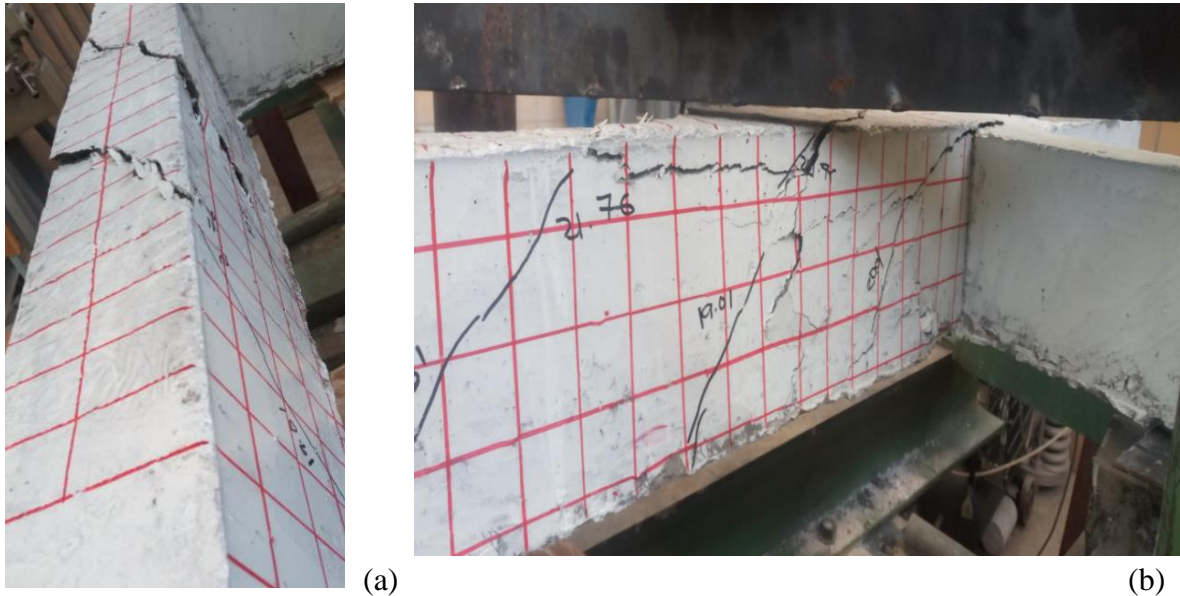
Torsional Cracks (a) Top View (b) side view
